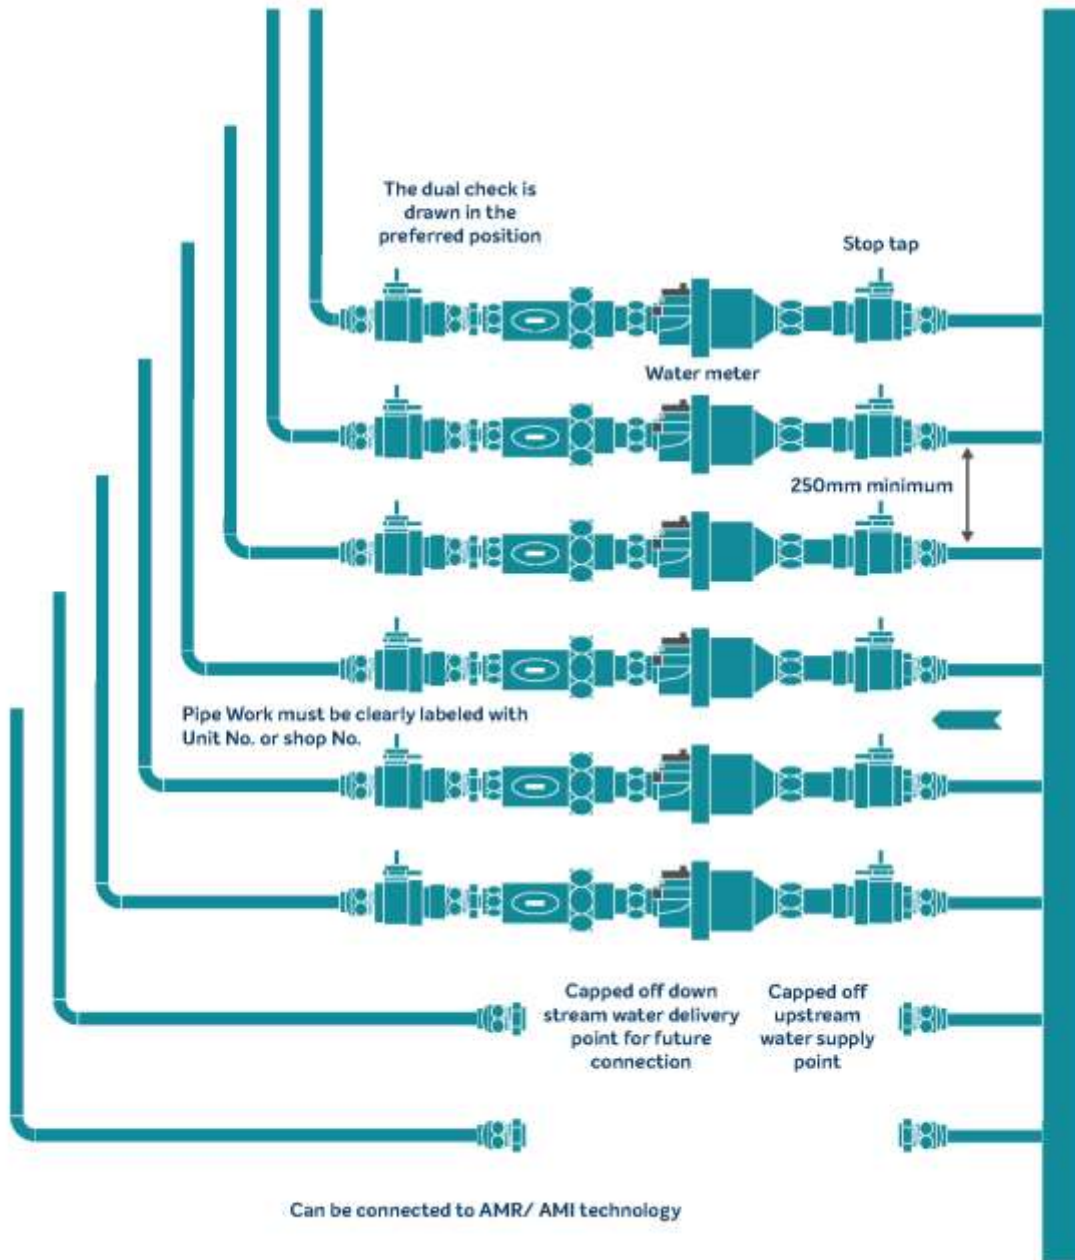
Multi-meter 20 & 25mm meter cabinet / utility room installation
